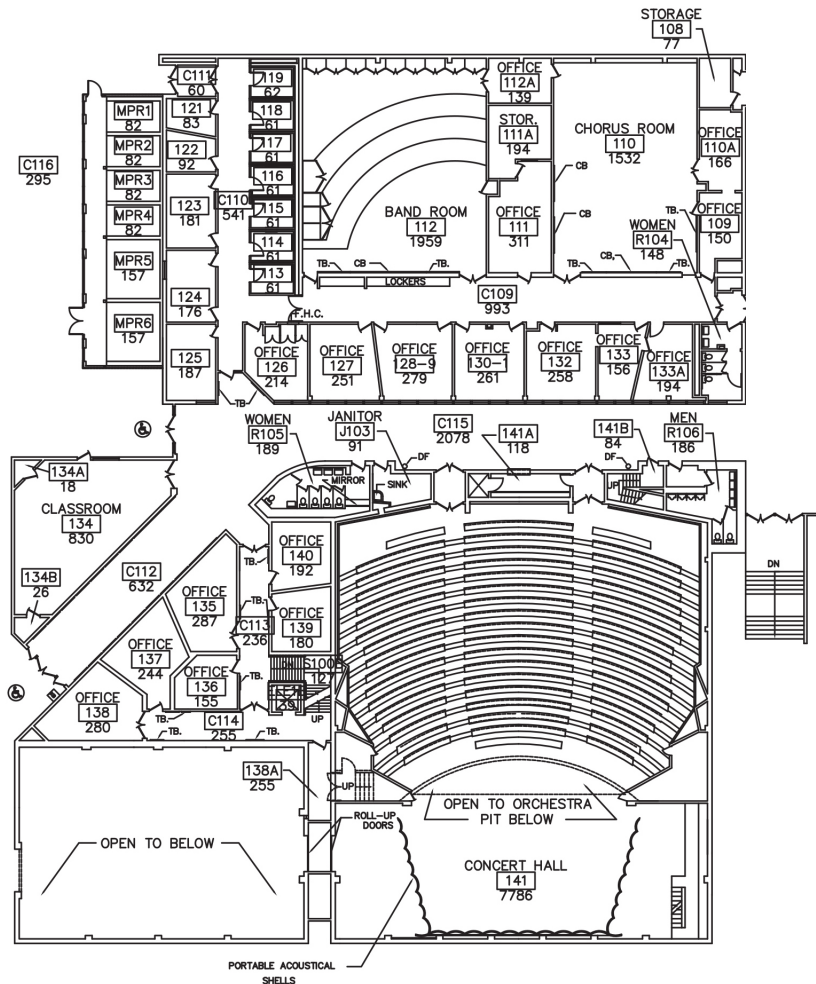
Floor plan of the Church Fine Arts Building, UNR
